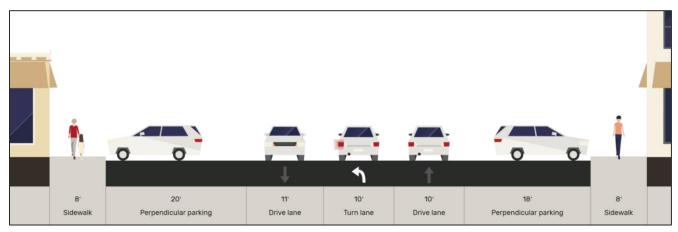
Proposed Cross Section of Williams Avenue with road diet and buffers
